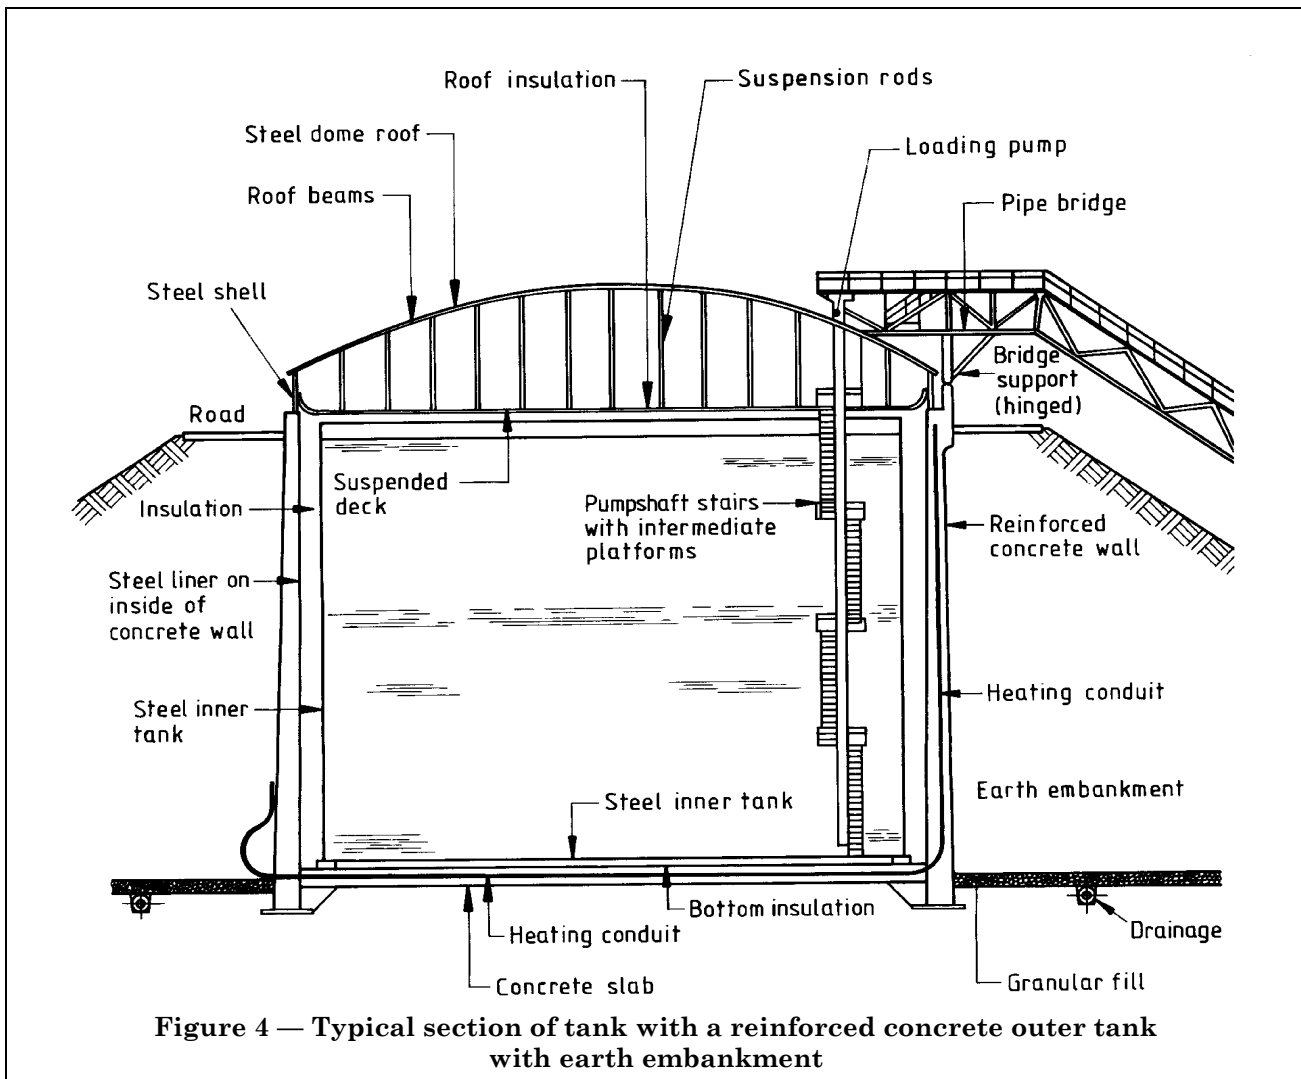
Typical section of tank with a reinforced concrete outer tank with earth embankment
